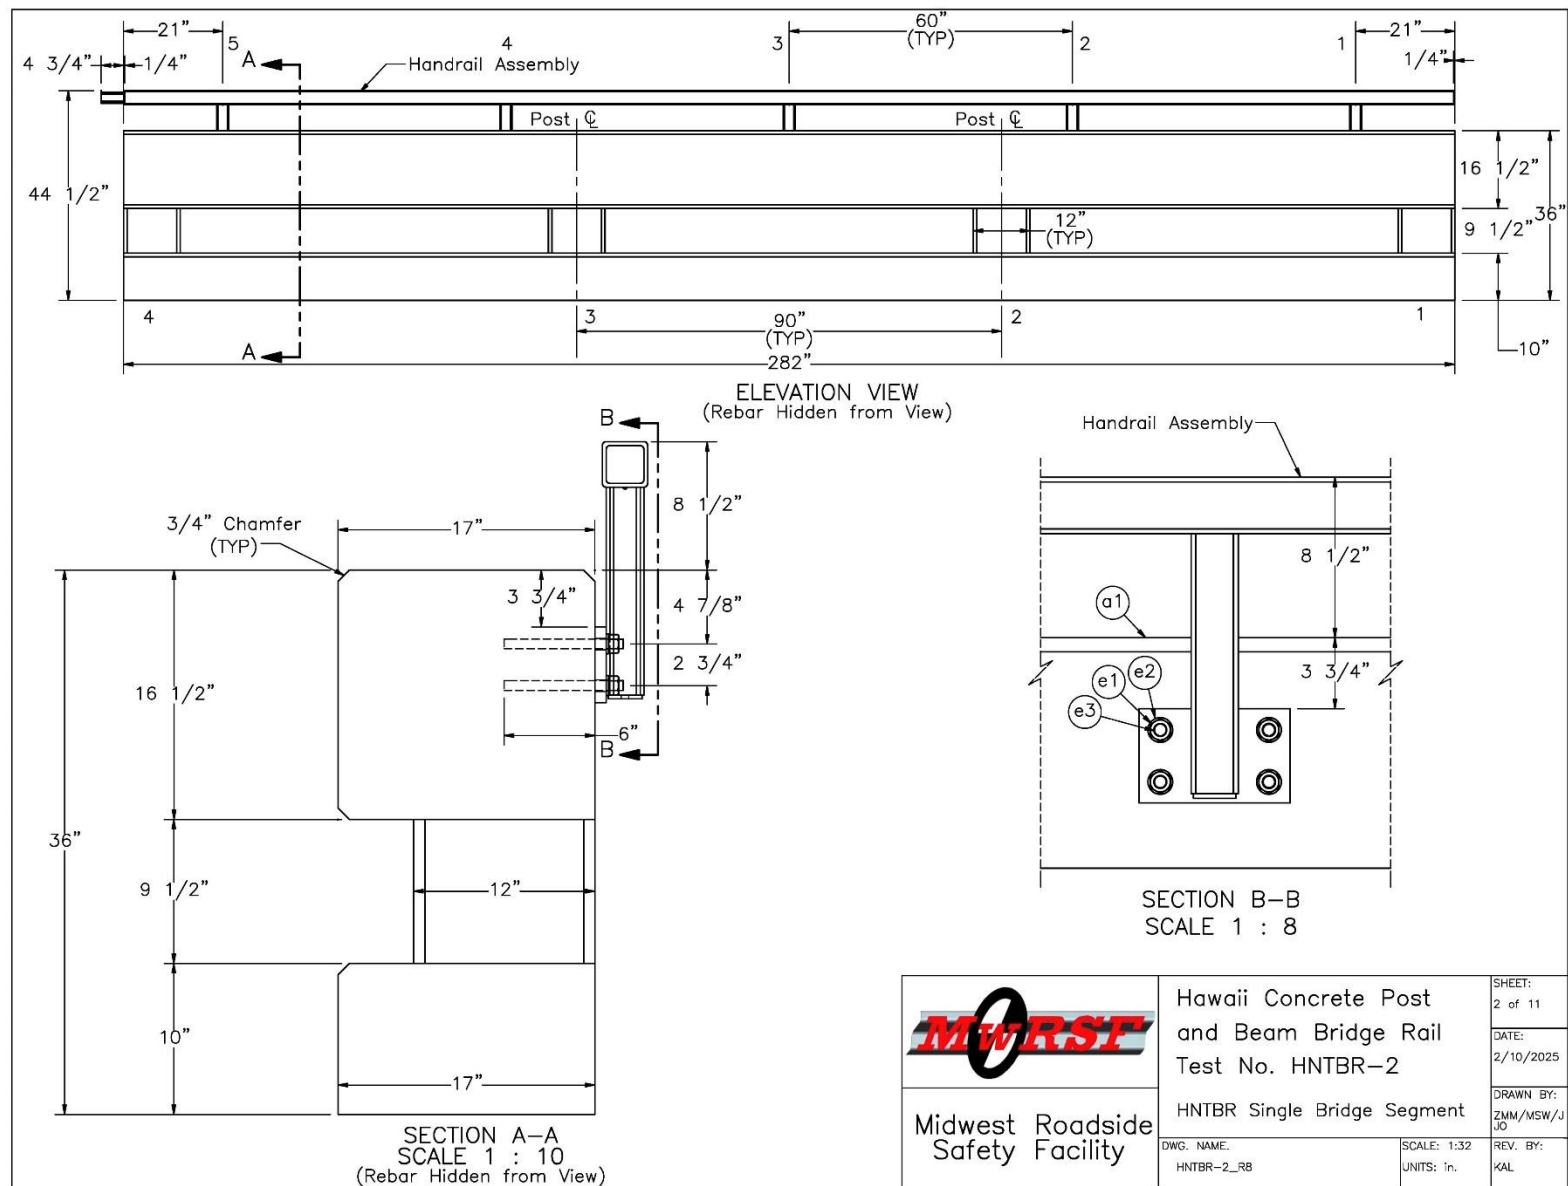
Bridge Rail Layout, Test Nos. HNTBR-2 and HNTBR-3
